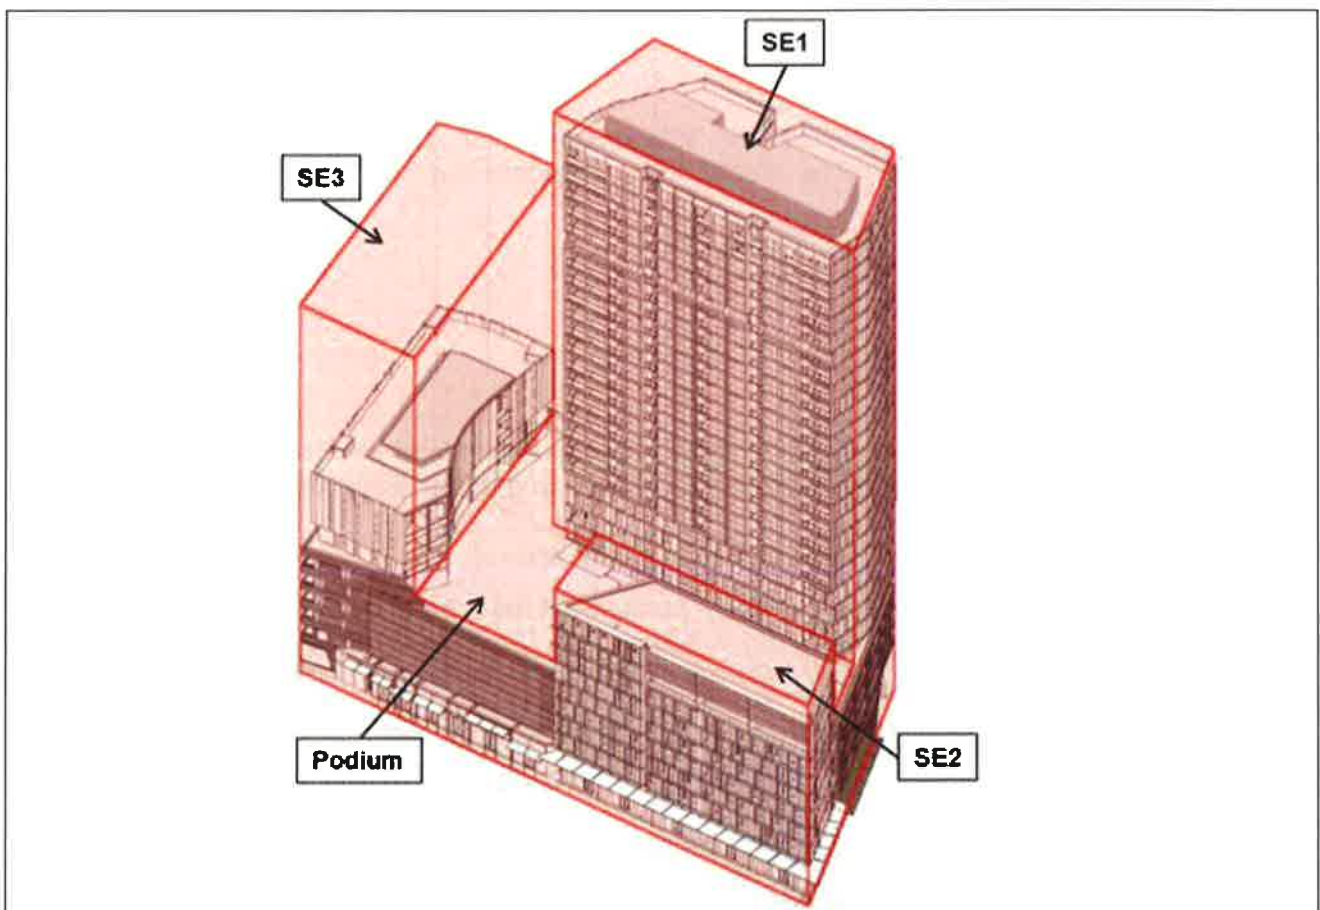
Stage 1 Concept Approval maximum SE Plot building envelope (red) and the proposed development (Source: Applicant's EIS)
